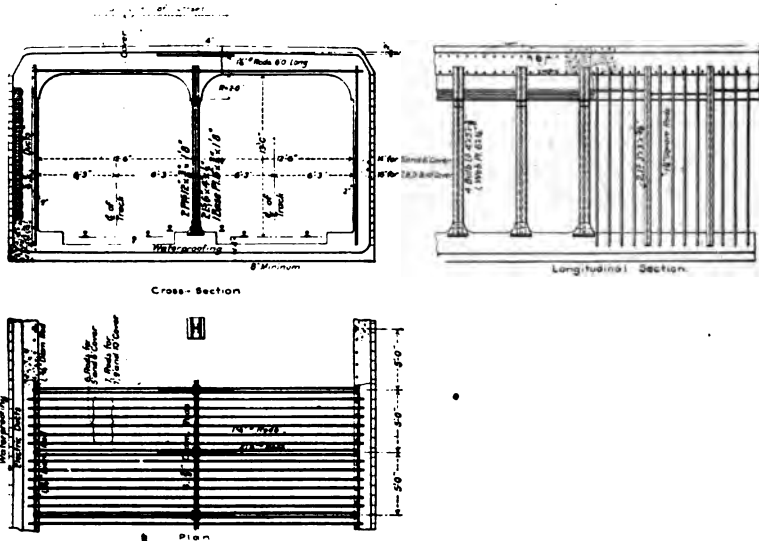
Subway Construction New York Rapid Transit R.R.
